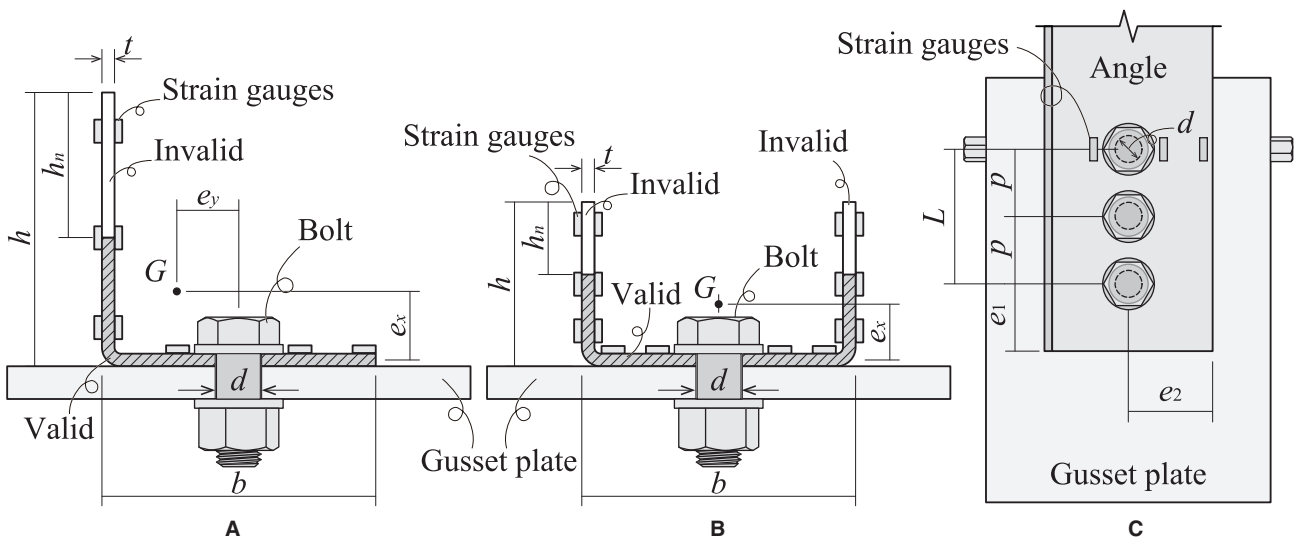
Details of the bolted connections of the brace specimen with an asymmetric cross-section: (A) angle member, (B) channel member, and (C) detail of the bolted connection
